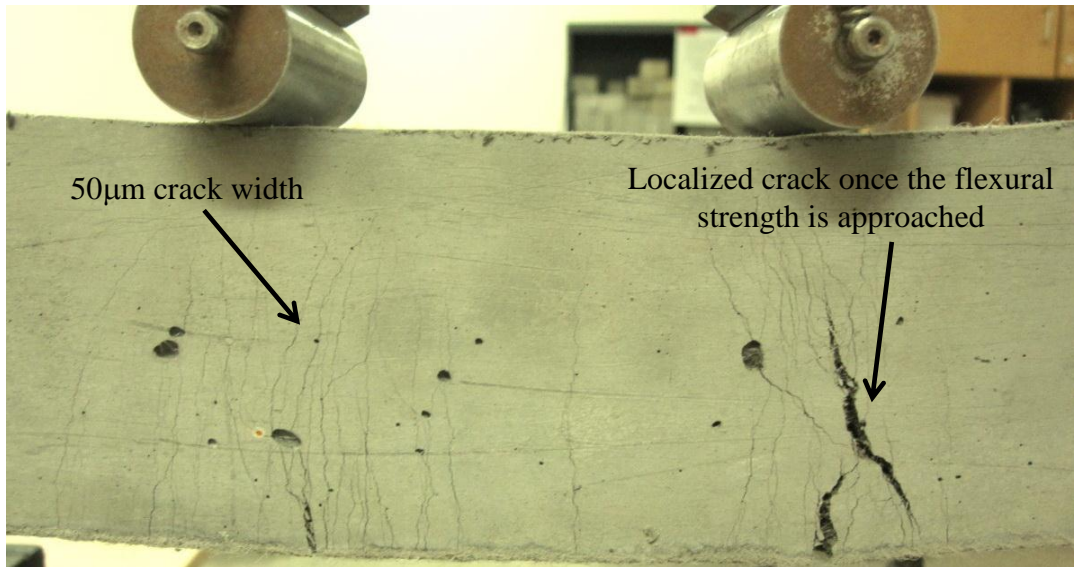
Typical cracking patterns of ECC beam specimen after flexure loading
